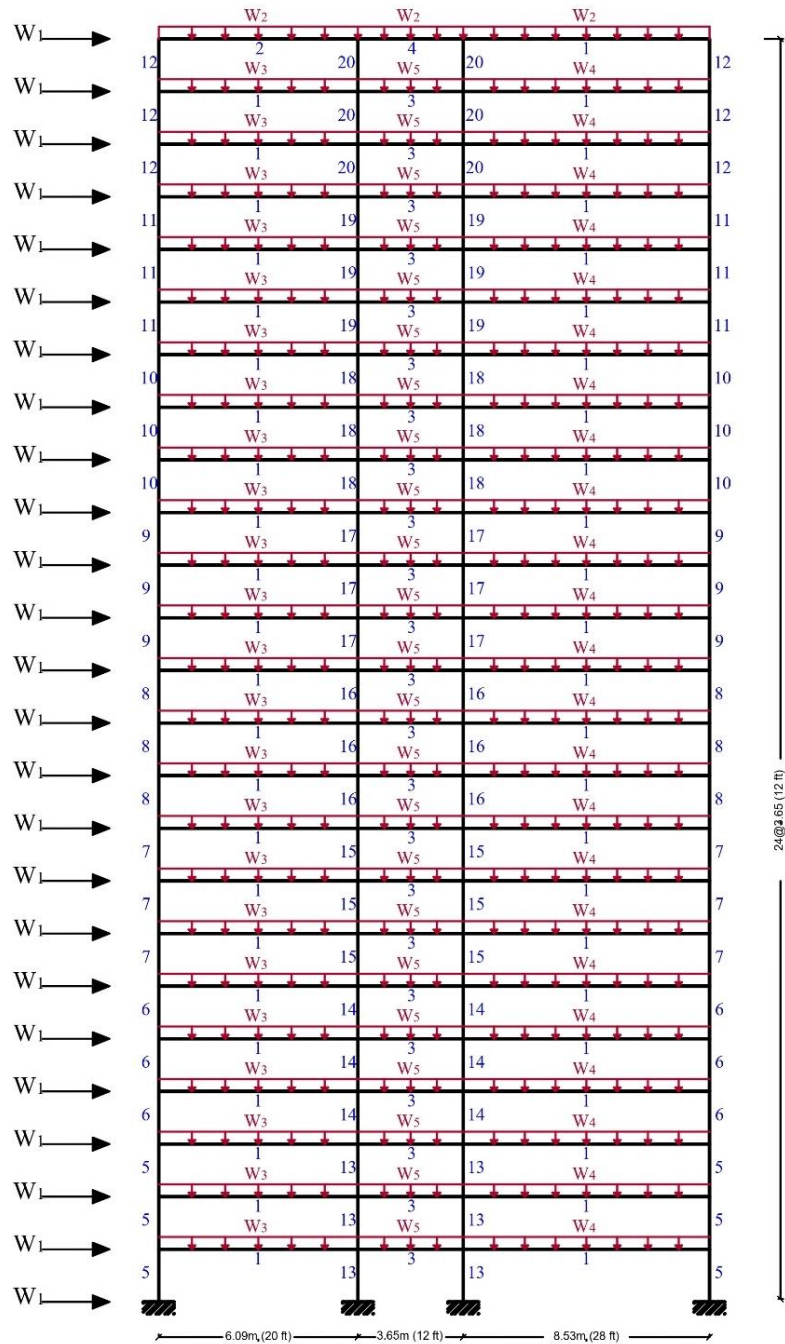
Geometry and loading of the twenty-four-story steel moment frame
